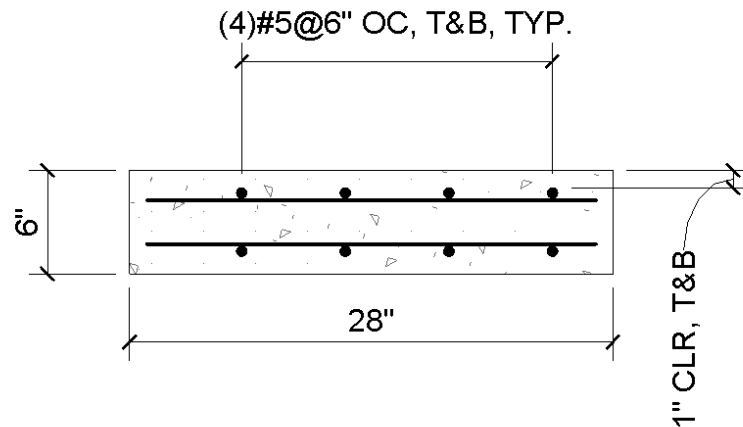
Cross-section of 6 in. thick deck panel specimen.
